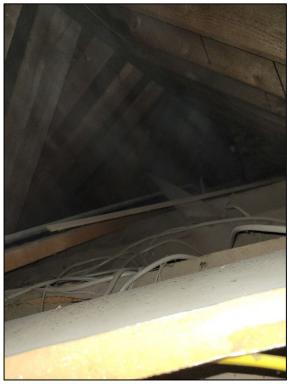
April 11, 2023. First Floor attic: Wood framed attic with loose insulation, black tar from roof, and utilities running over trusses.
